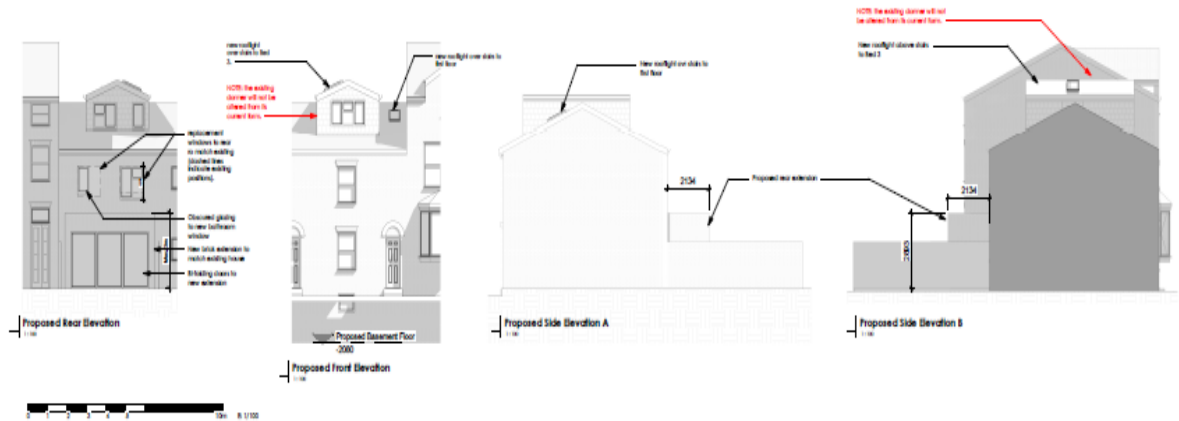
A1-08-B - Site Location, Proposed Site Plan, Proposed Floor and Roof Plans and Elevations (received 22/01/20)
